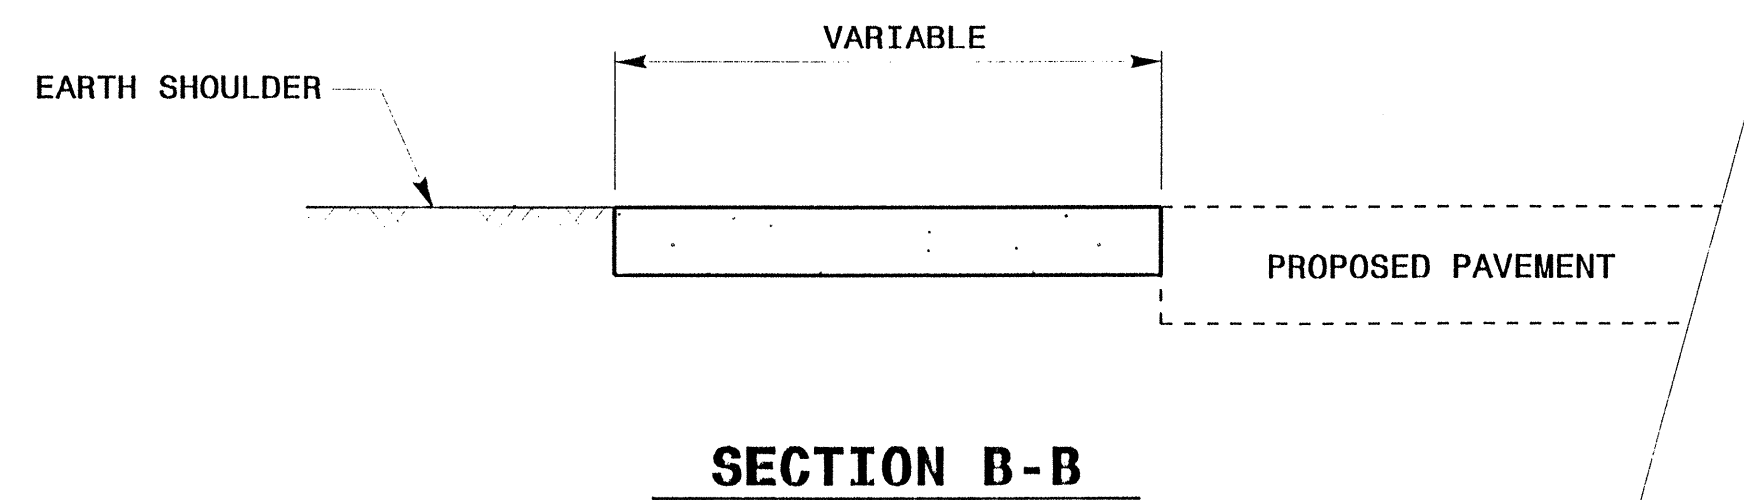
DETAIL OF PROPOSED CONCRETE BRIDGE SIDEWALK APPROACH
